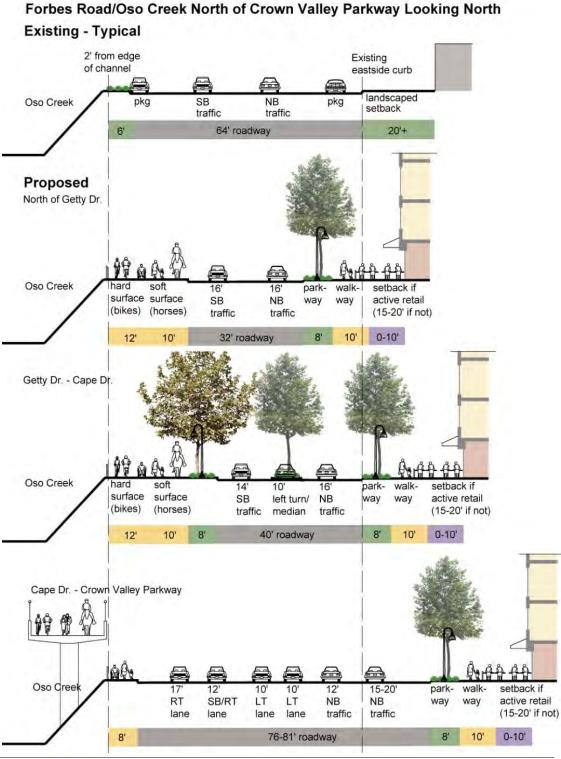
B Forbes Road, North of Crown Valley Parkway: Cross Sections—Looking North
